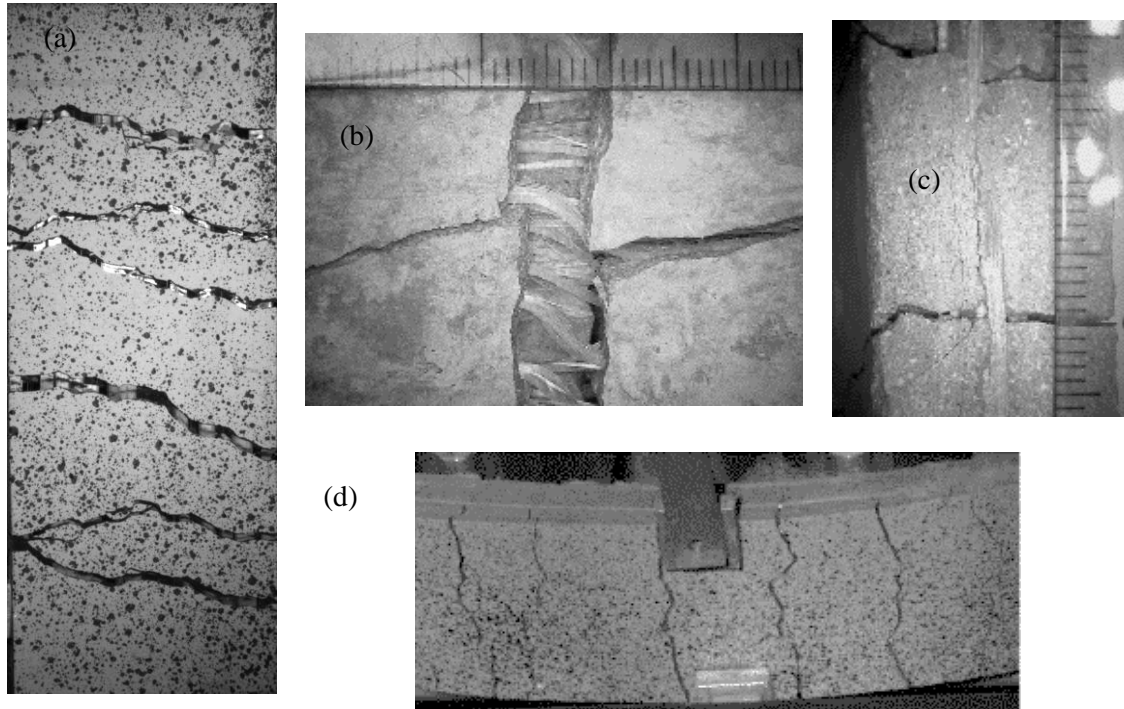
Parallel cracking in (a)PP composite laminates under tension, (b) crack bridging across the sample width, (c) crack bridging through thickness; and (d) distributed flexural cracks under four-point bending in MF40 composite
